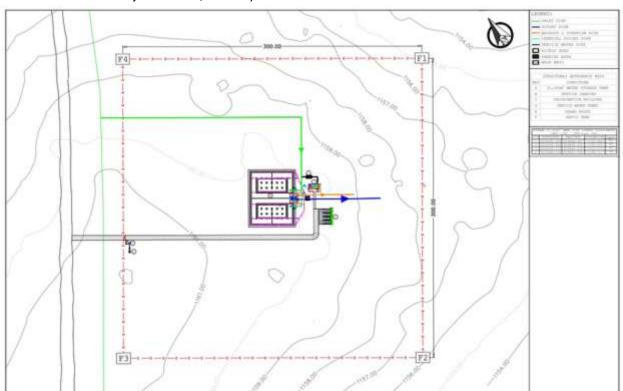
Ihumwa Storage Tank - Site Layout of 10,000 m3 Reservoir
